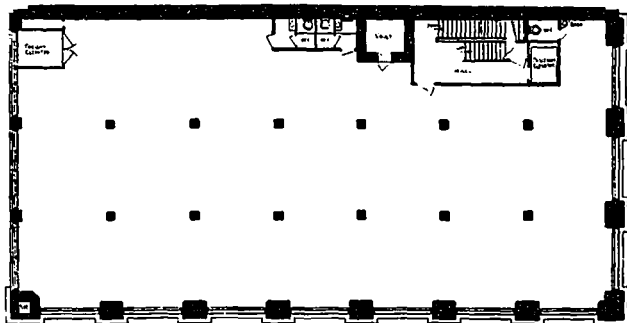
UPPER FLOOR PLAN, OGILVIE BUILDING, TORONTO, SHOWING HEAVY BRICK WALL PIERS THAT PERMIT OF EXTRAORDINARILY LARGE WINDOW OPENINGS, THUS GIVING THE DIFFERENT FLOORS THE MAXIMUM DEGREE OF LIGHT.
